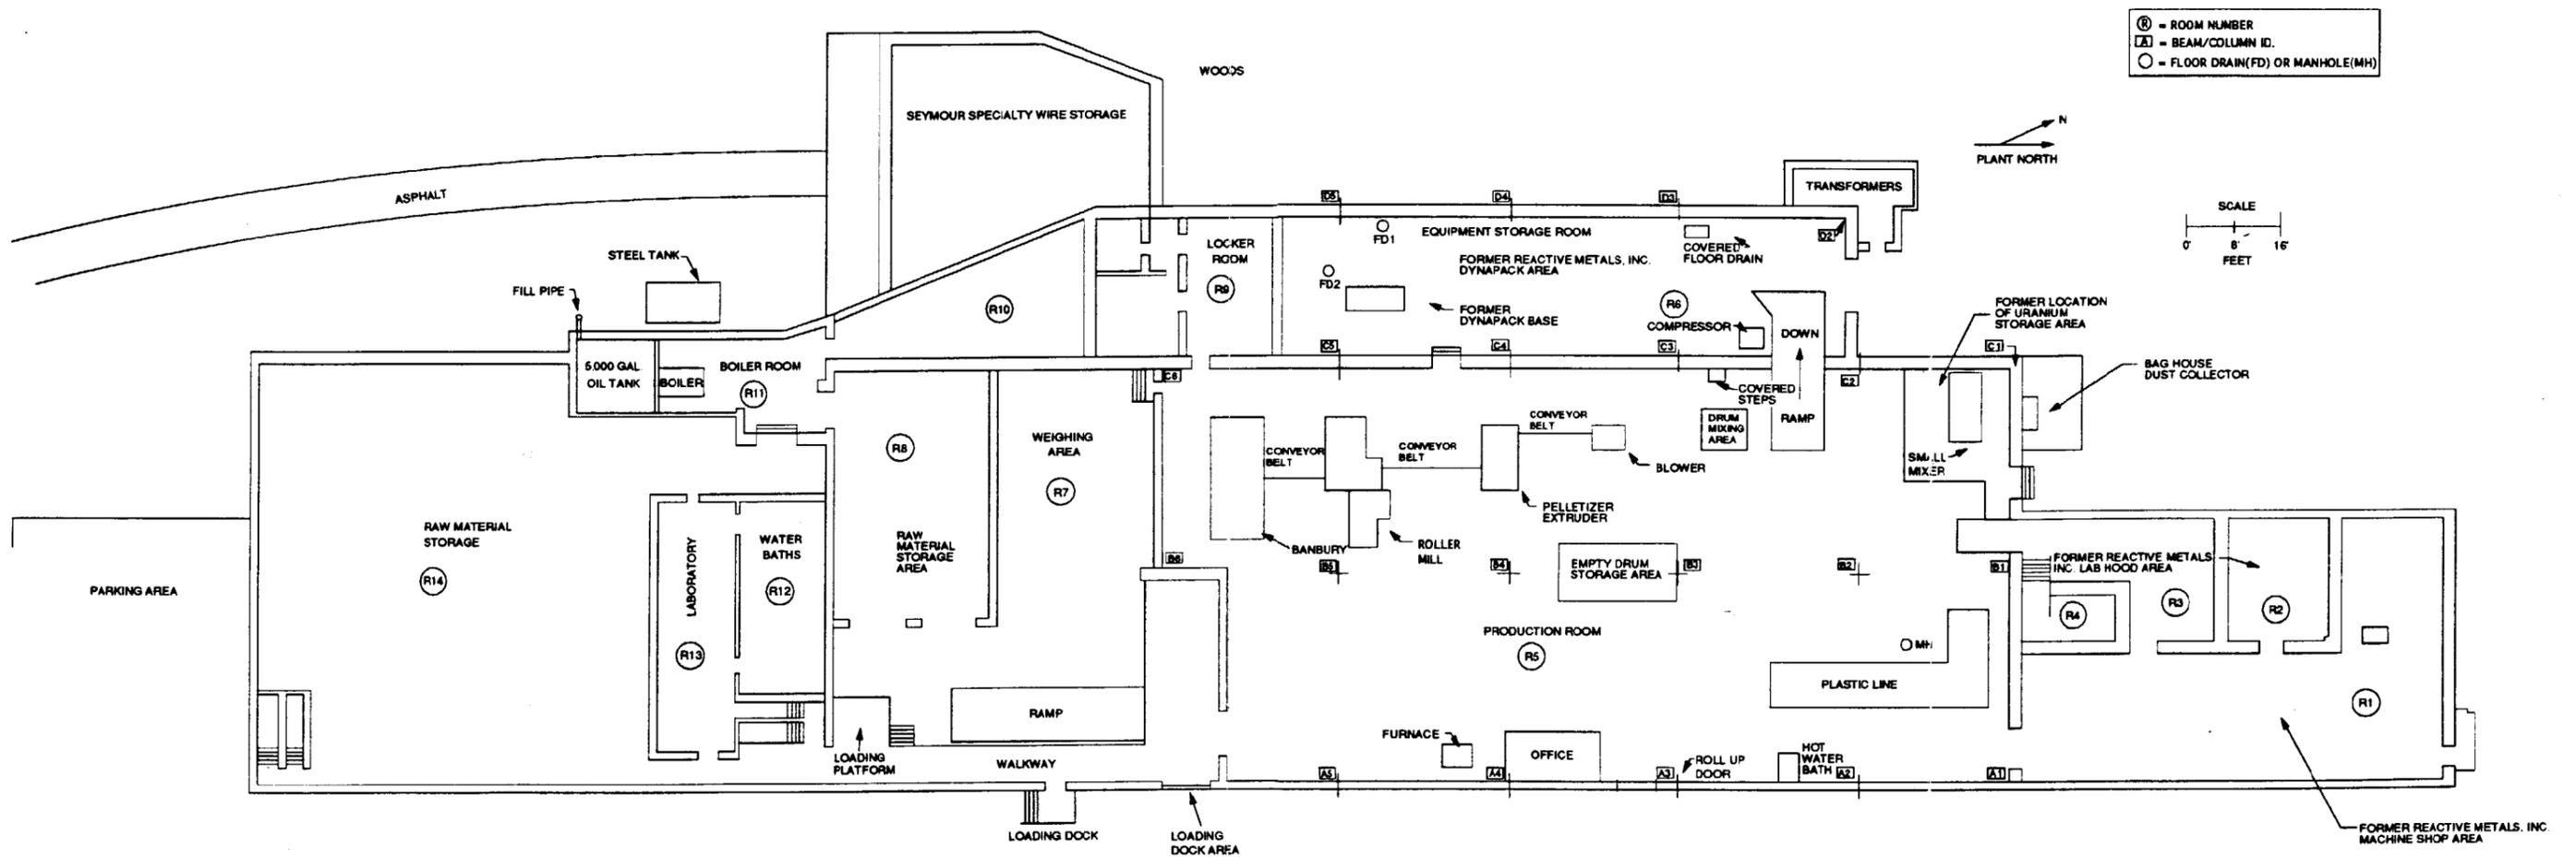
Diagram showing the floor plan of the Ruffert building.
